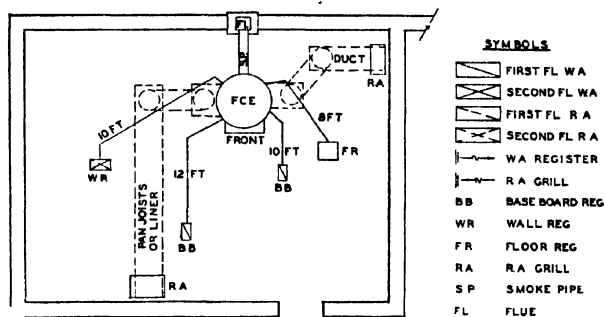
TYPICAL BASEMENT LINE DRAWING
